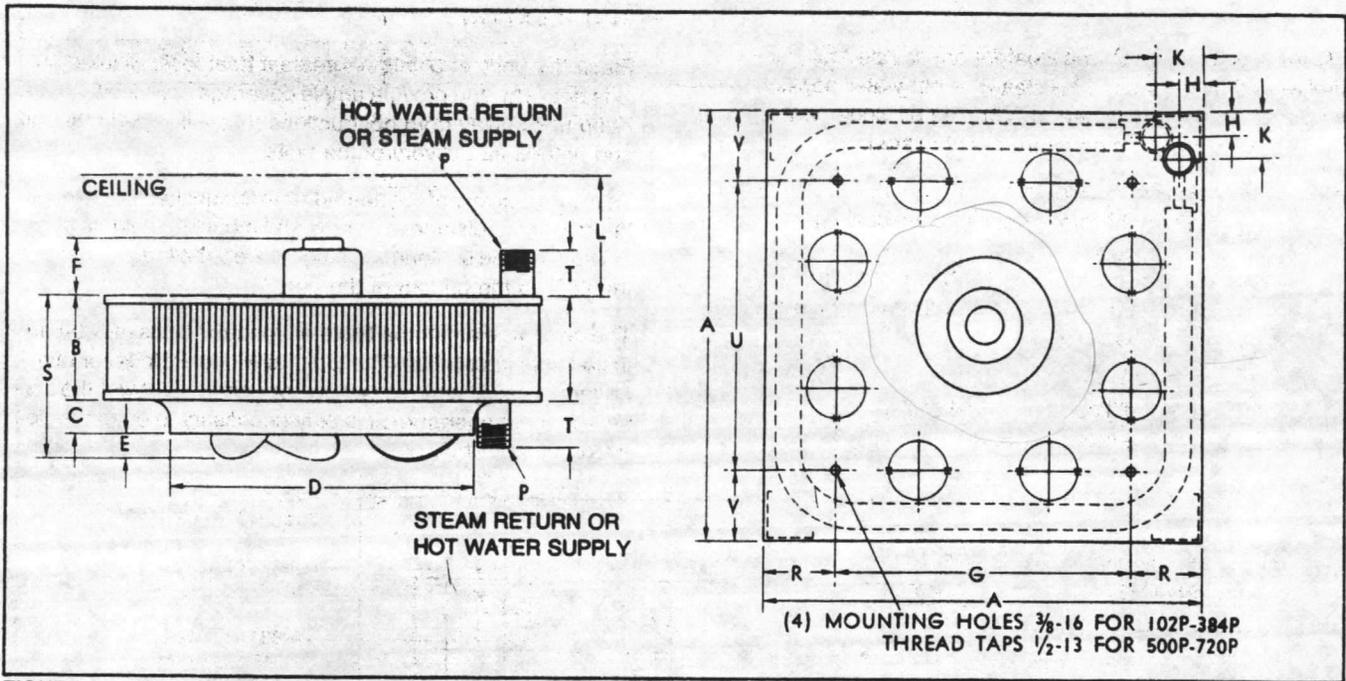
Dimensions, Model P Unit Heater, Sizes 102-720
